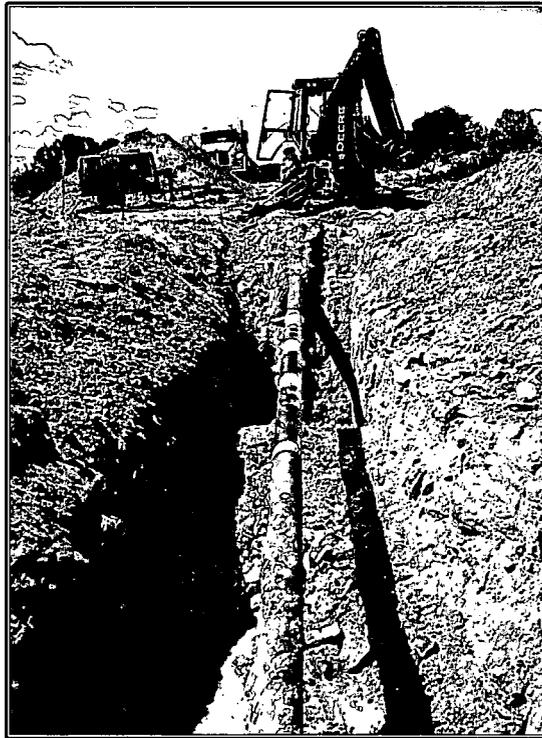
View of rubber tired backhoe equipped with rock teeth used during the excavation.
